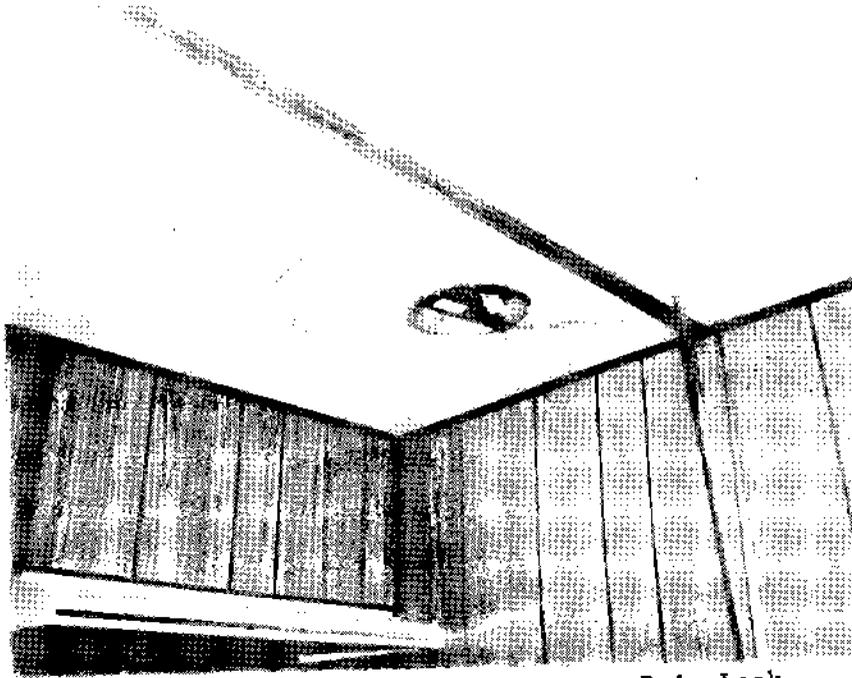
Water Damage to Ceiling Due to Rain Leak at Vent Stack Penetration Through Roof
